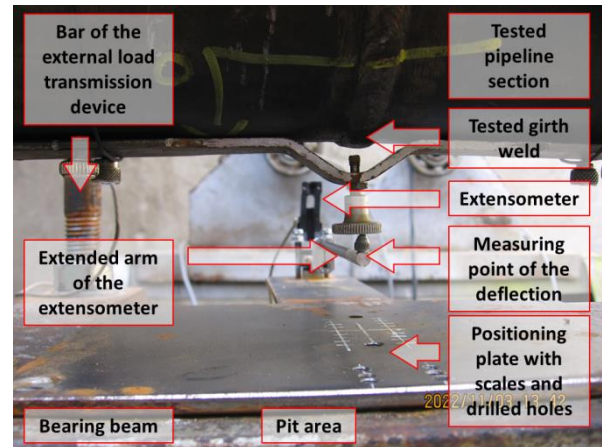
The master-plate for the positioning of the pipeline section and the girth weld.
